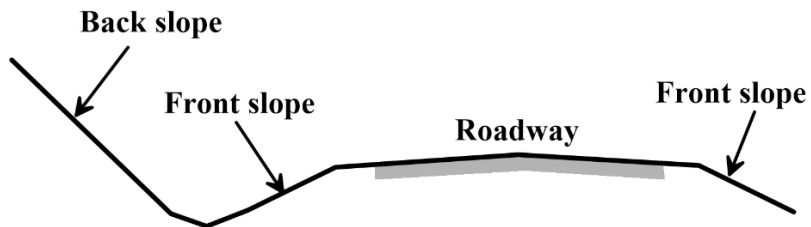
Definition of front slope and back slope along a typical highway cross-section.
